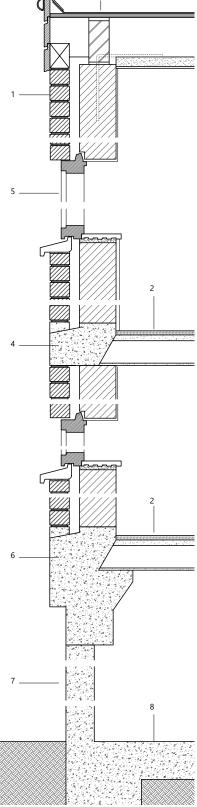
detailed section through north elevation (1:20) redrawn from archived drawings.
